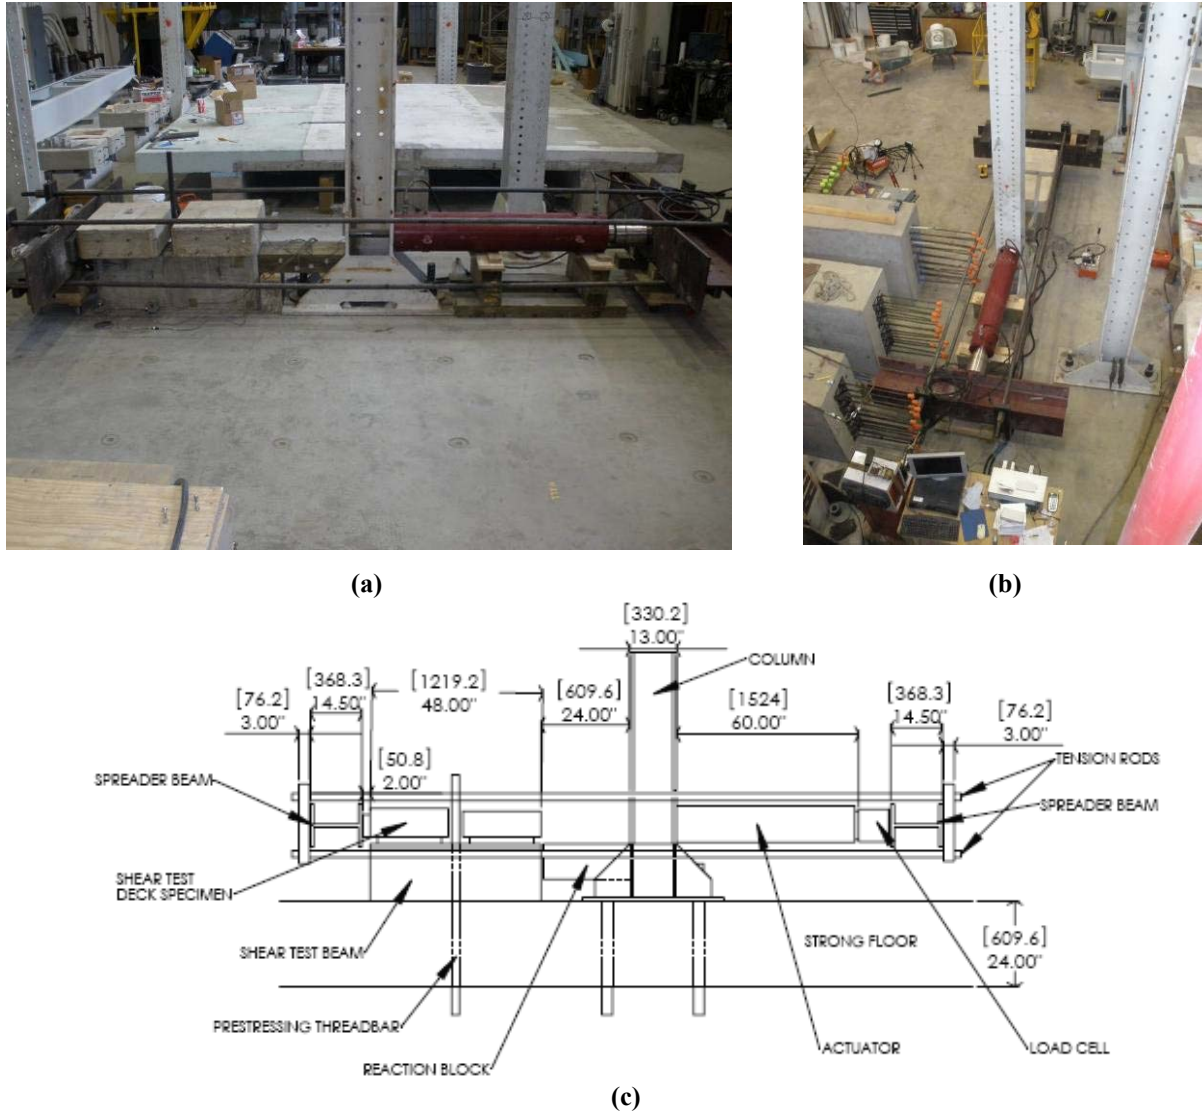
Experimental Test Setup: (a) Photograph from Laboratory Floor; (b) Photograph from Laboratory Balcony; (c) Side Elevation.
